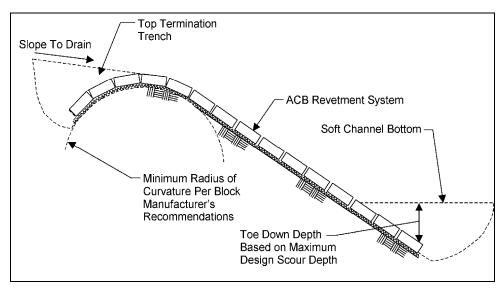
Recommended layout detail for bank revetment at the I-70 Bridge site.
